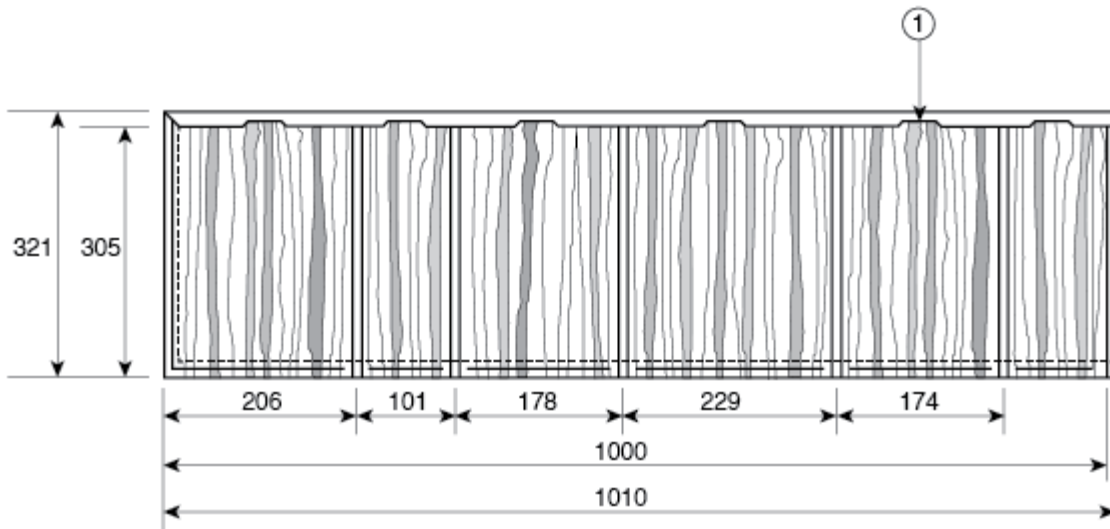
“MetalWorks® -AstonWood® Steel Shingles”
